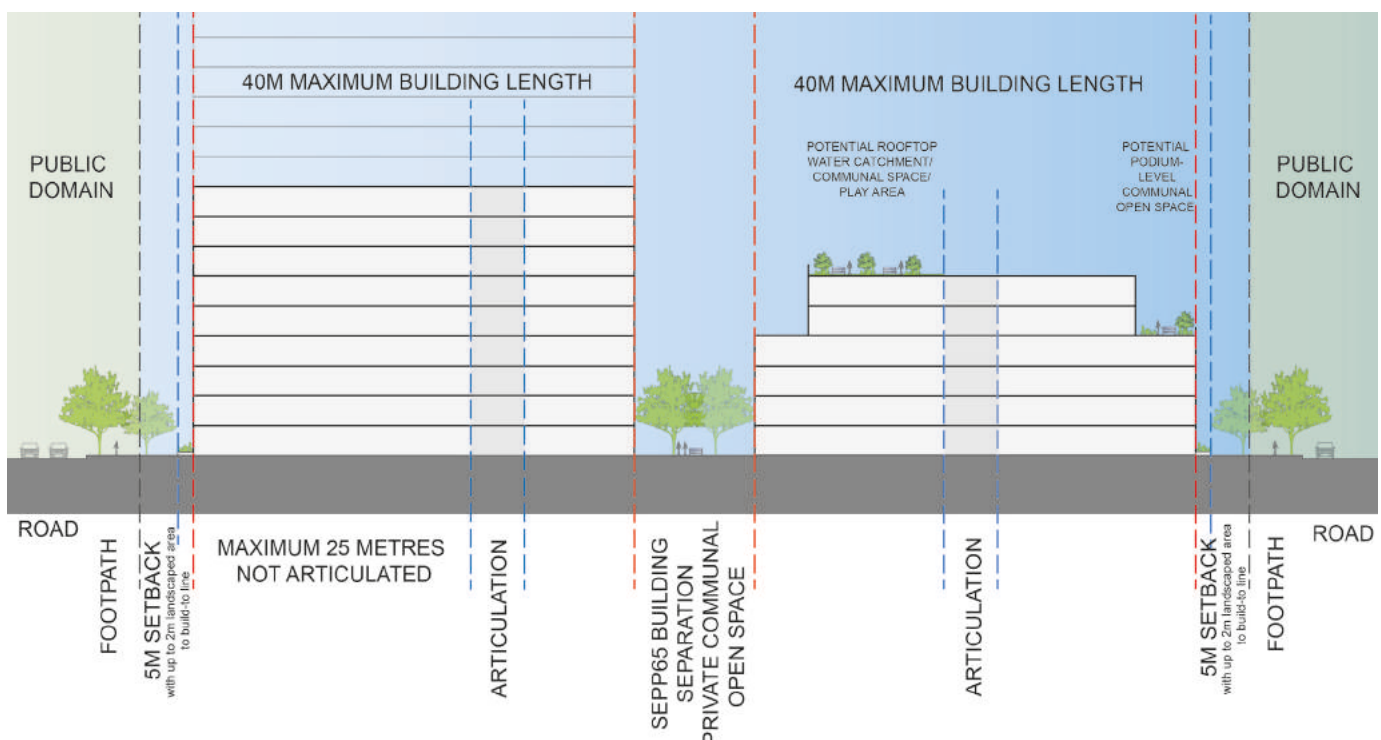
Section Illustration - Building Design Guidelines
